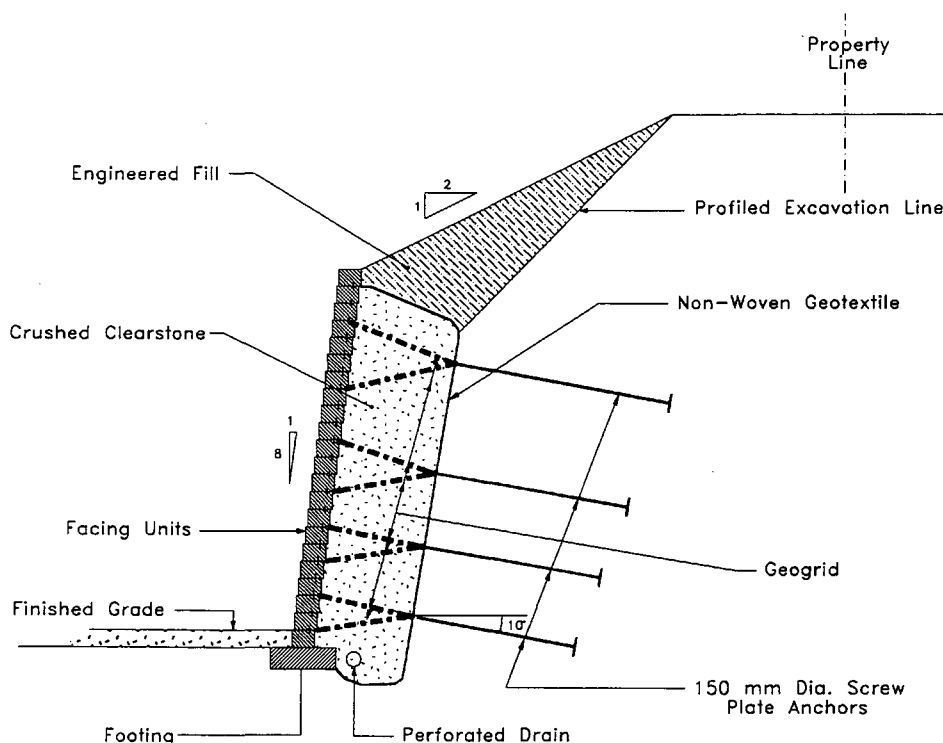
Section through reprofiled slope, Dufferin Street site.
